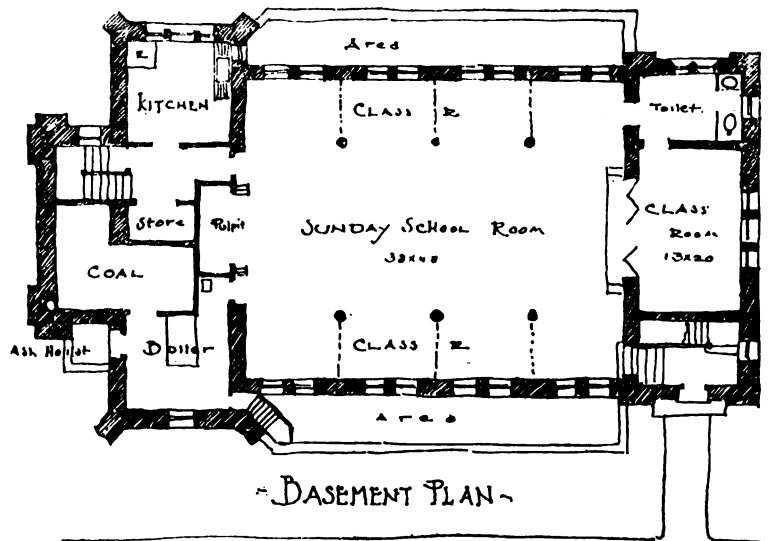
CHURCH AT KATONAH AVENUE, NEW YORK CITY—BASEMENT PLAN.
